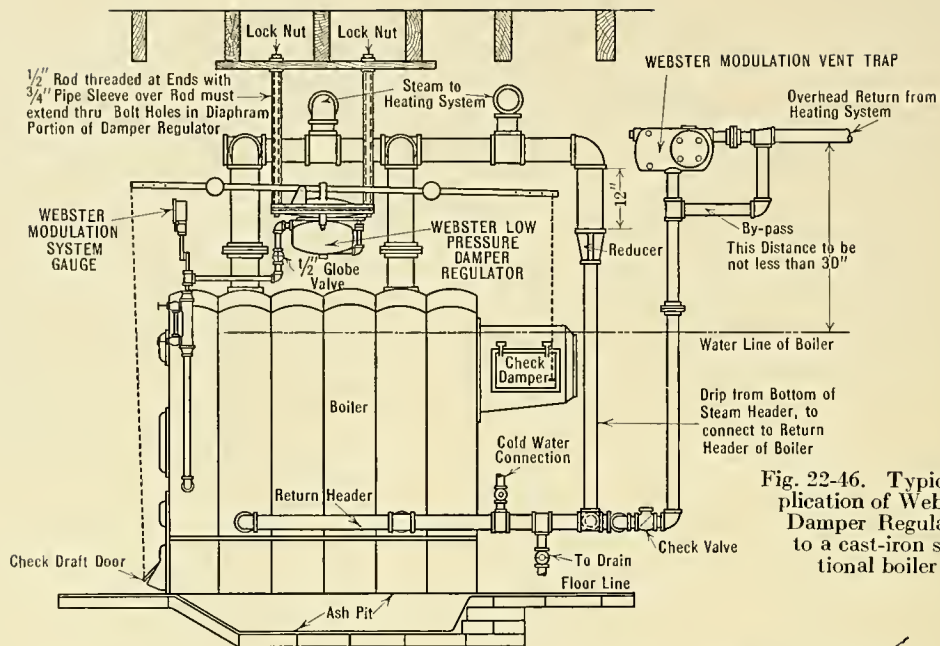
Typical application of Webster Damper Regulator to a cast-iron sectional boiler
